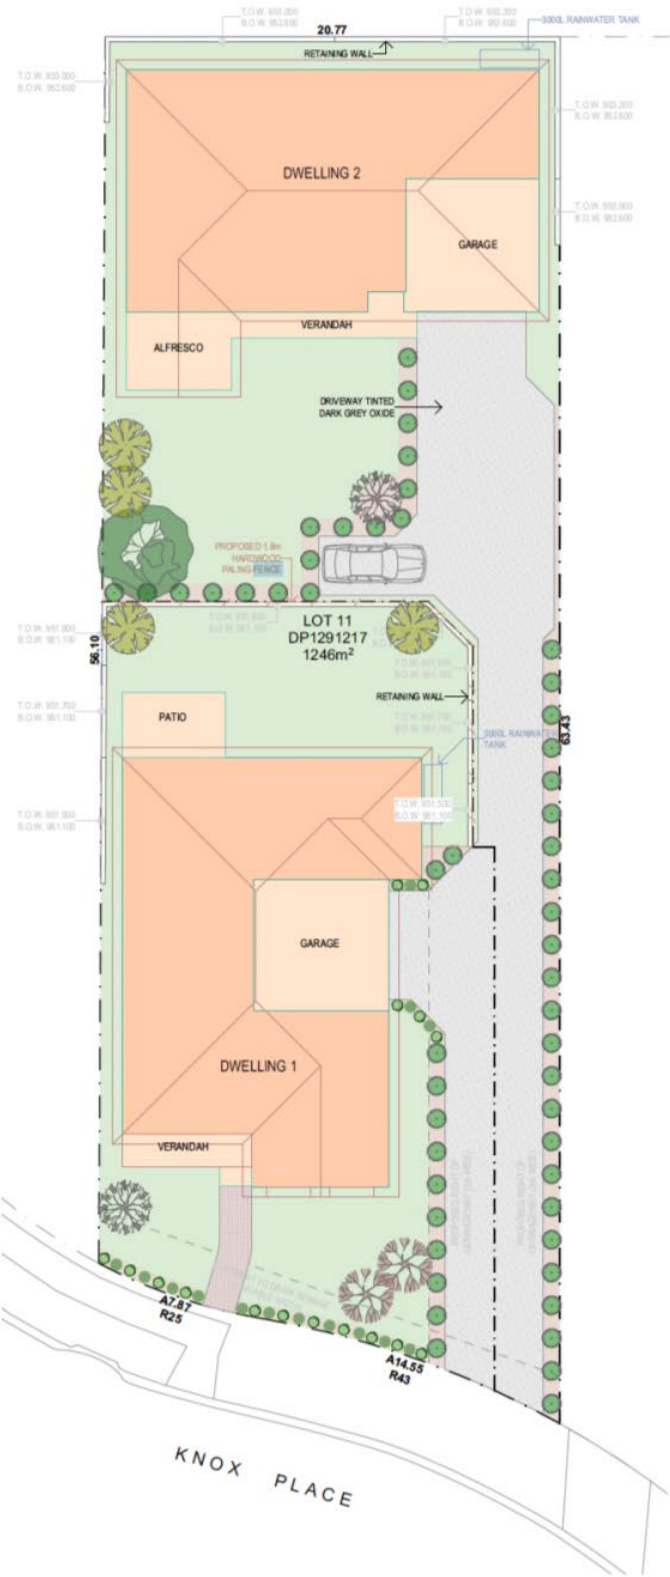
Extract from the landscaping drawing showing the positioning of the proposed built footprint and driveway. (Source: Bassmann Drafting Services, Drawing no. 2)
